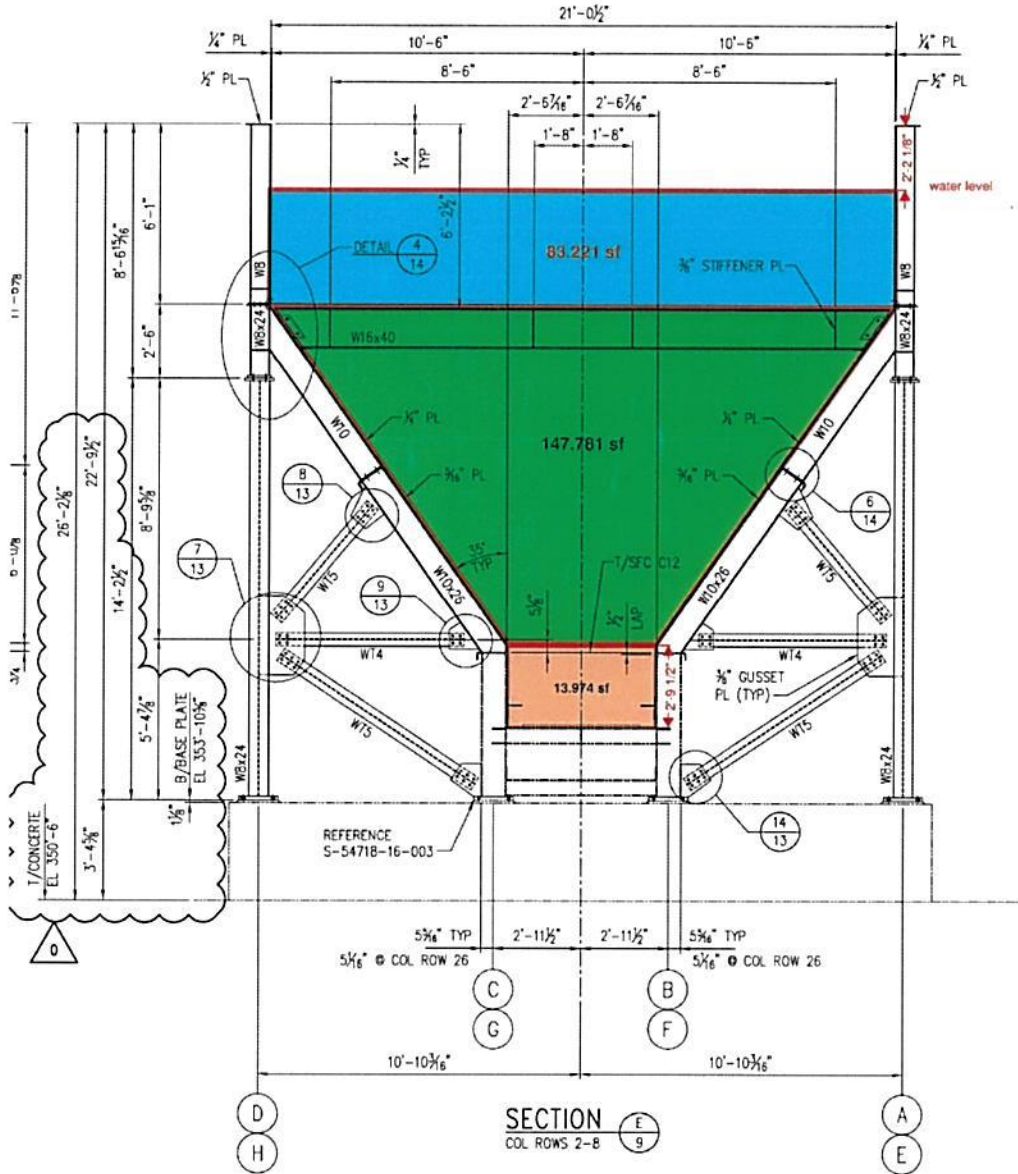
SFC cross sections (ref. UCC drawing S-54718-16-012)
